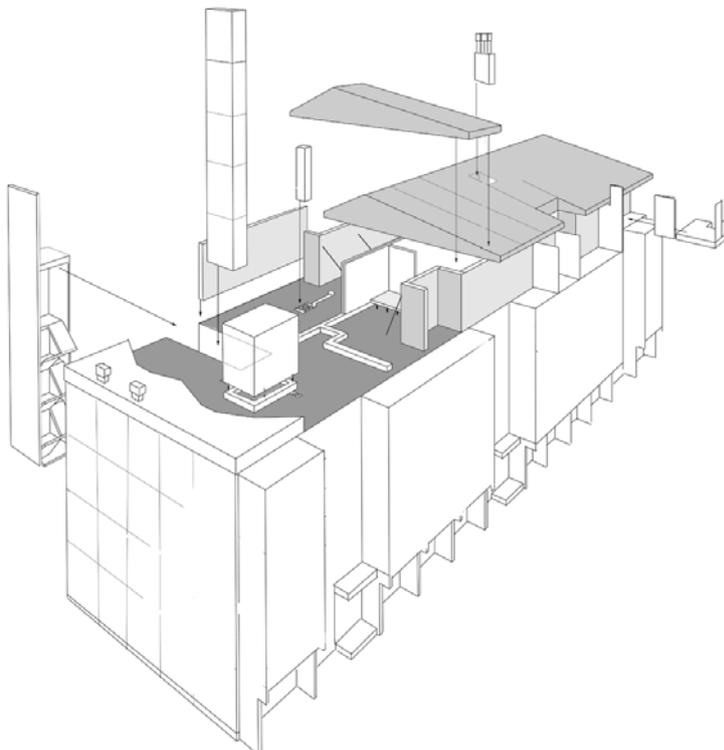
Modular components for renovation. Staircase, elevator shaft, bathroom module, load bearing light wall panels, roofing modules and balconies.
